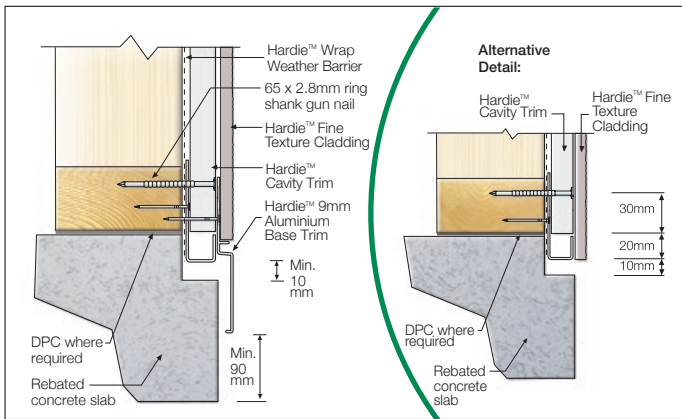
ALTERNATIVE SLAB EDGE DETAILS
